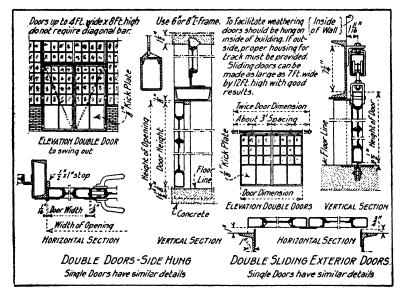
Details of "Fenestra" Tubular Steel Doors.
